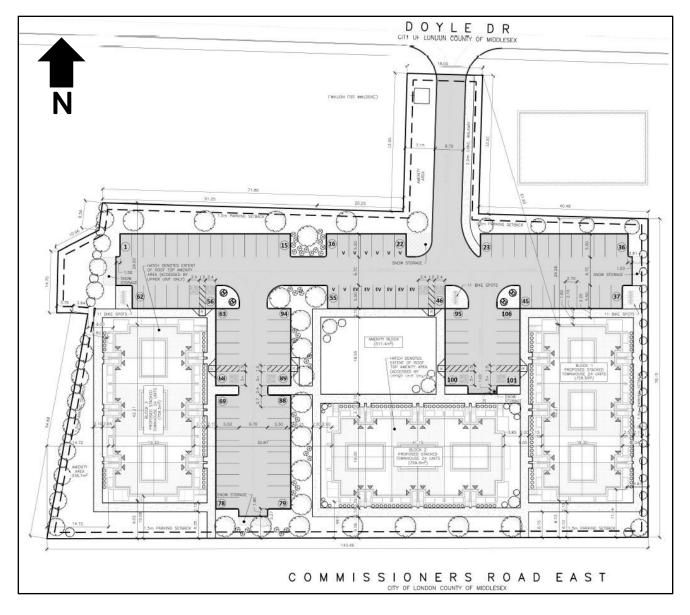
Conceptual Site Plan (received September 11, 2023)
